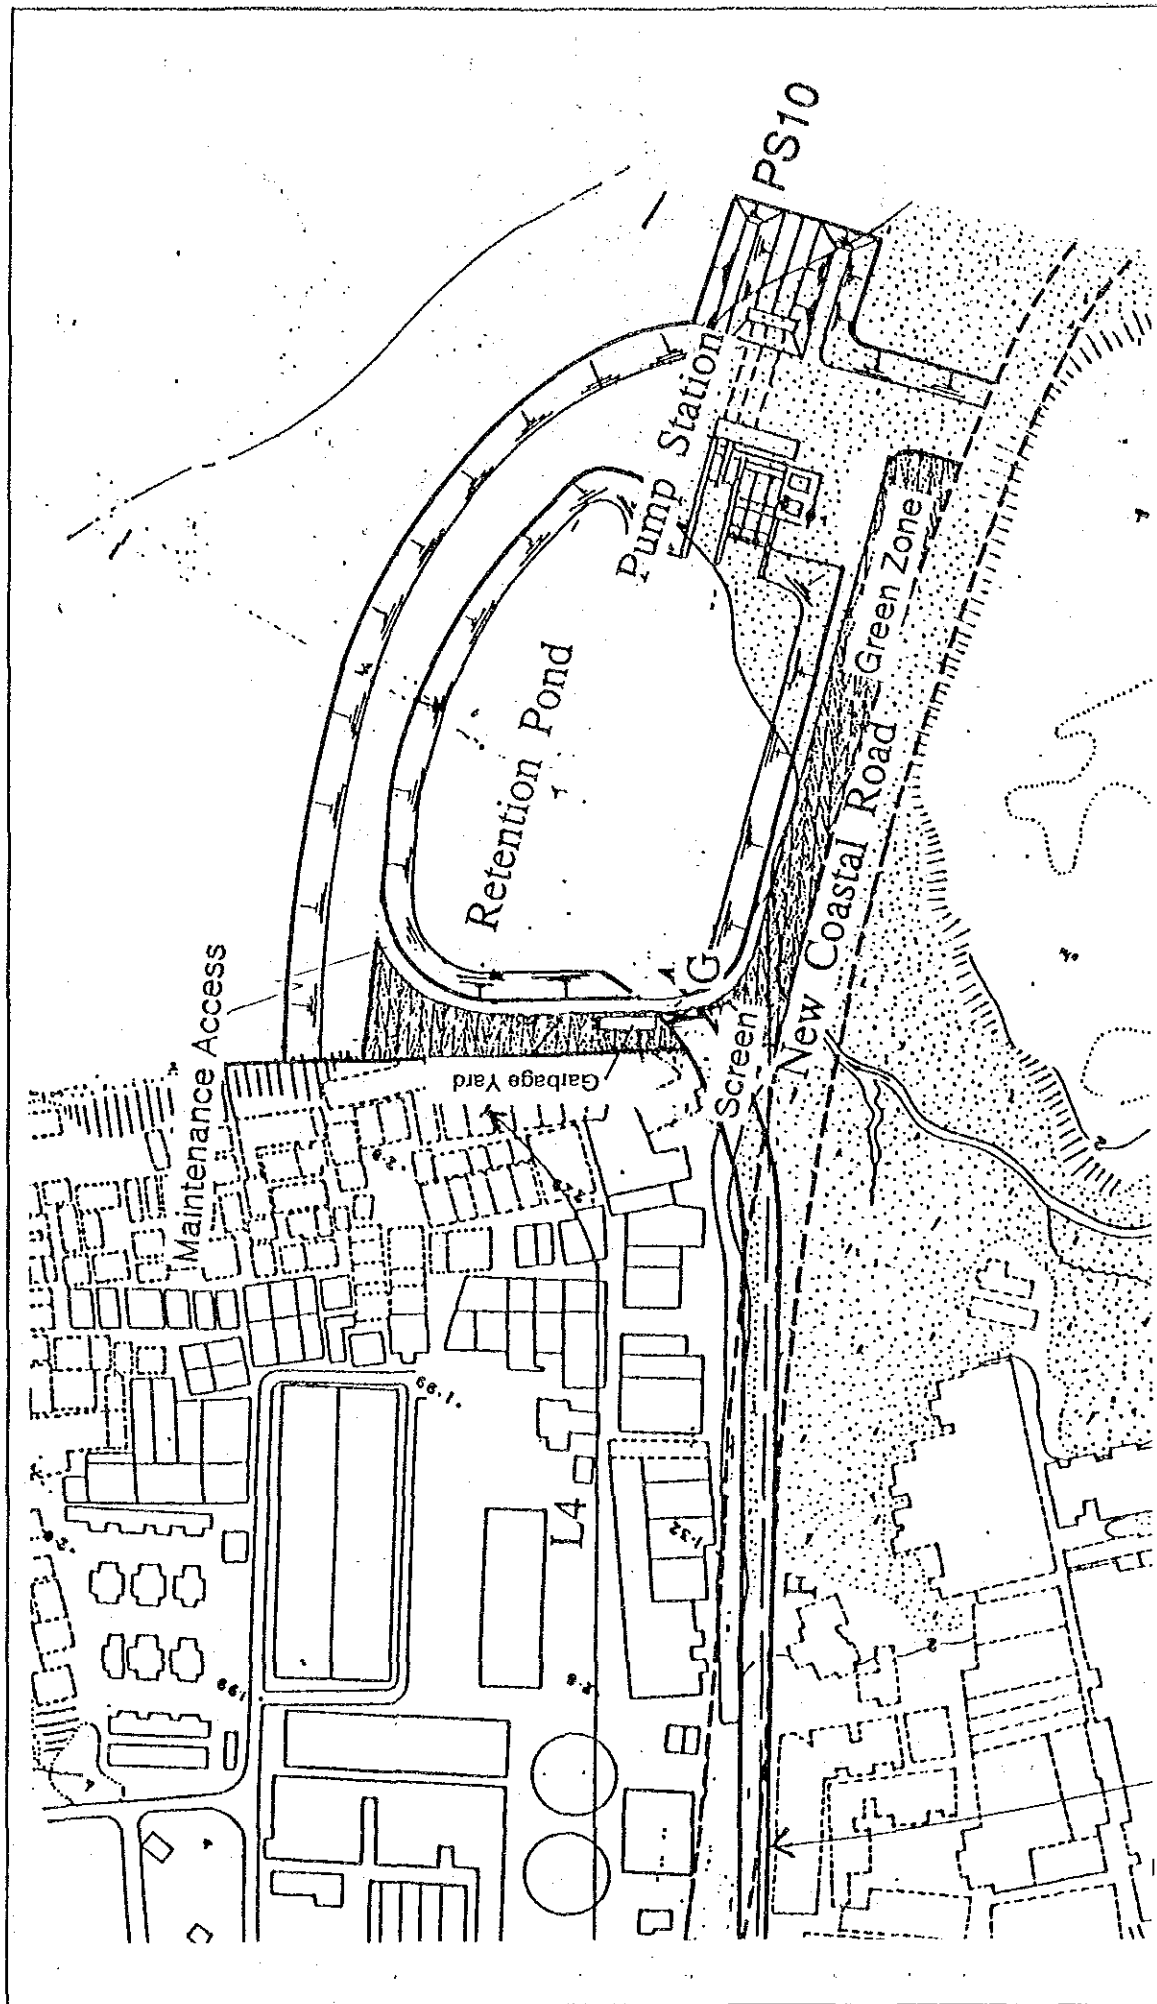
GENERAL PLAN OF S-10 RETENTION POND
